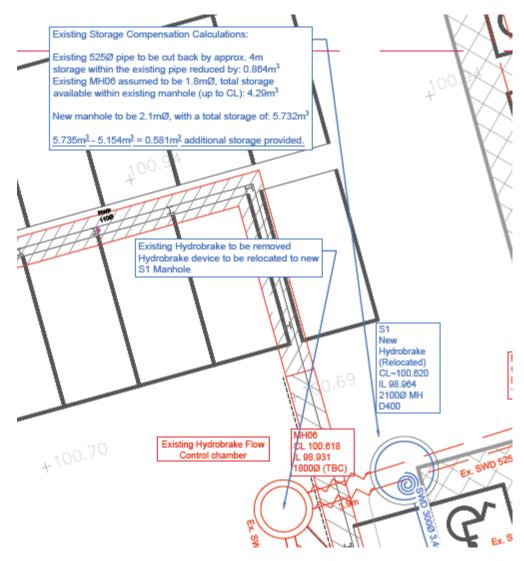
Proposed Drainage (drg. 9101) extract – Area 1
